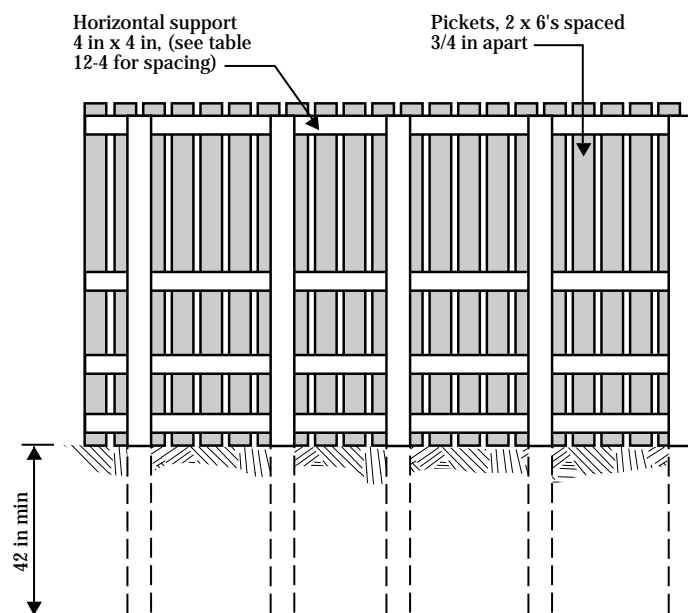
Picket dam for opentop storage drainage (MWPS 1985)Table 12-4 Picket dam construction (MWPS 1985)
